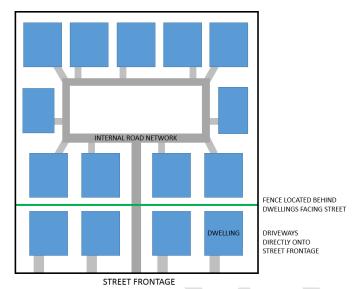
Example of a multi-dwelling housing addressing the street frontage
